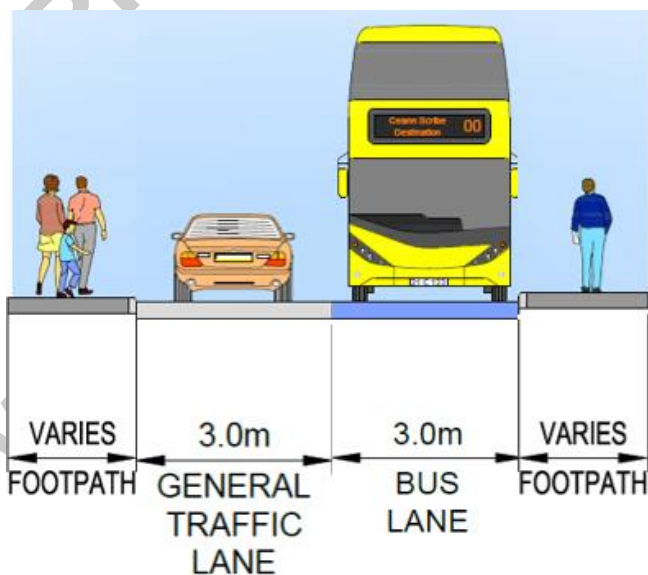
Section 2B, Proposed Option 2 – Cross Section A-A
